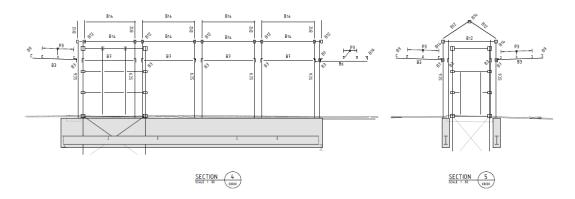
Steel structure elevation around lantern opening to support canopies
